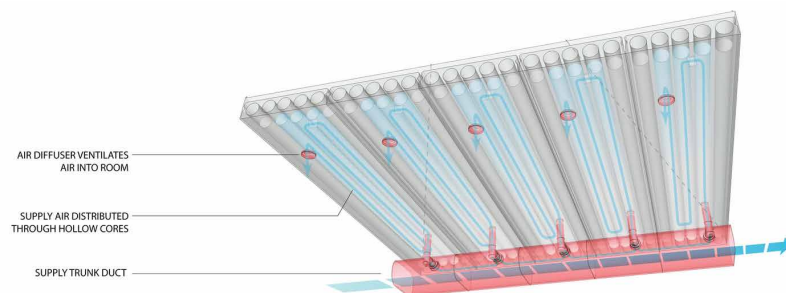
Ventilated hollow core floor element in which ventilation air running through the cores is preconditioned from stored in the mass of the floor. Reprinted from <http://www.termobuild.com/about/>
